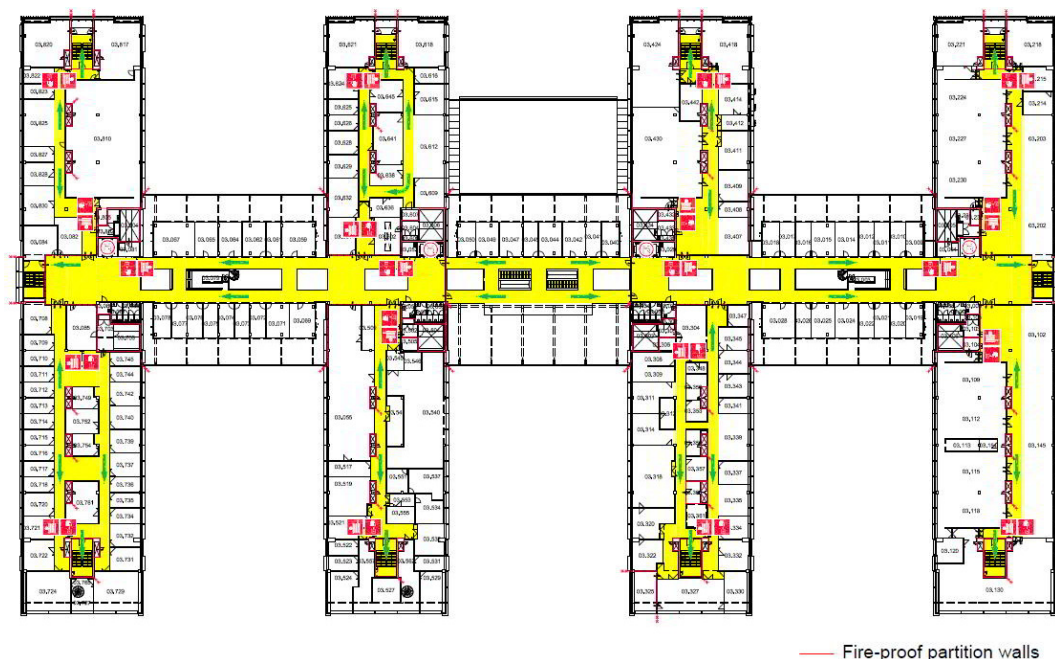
Floor plan of the 3rd floor of the Huygens building, showing the fire-proof partitions around the fire compartments in red, as well as fire alarm buttons, hose reels and the flight routes to the emergency stairways.
